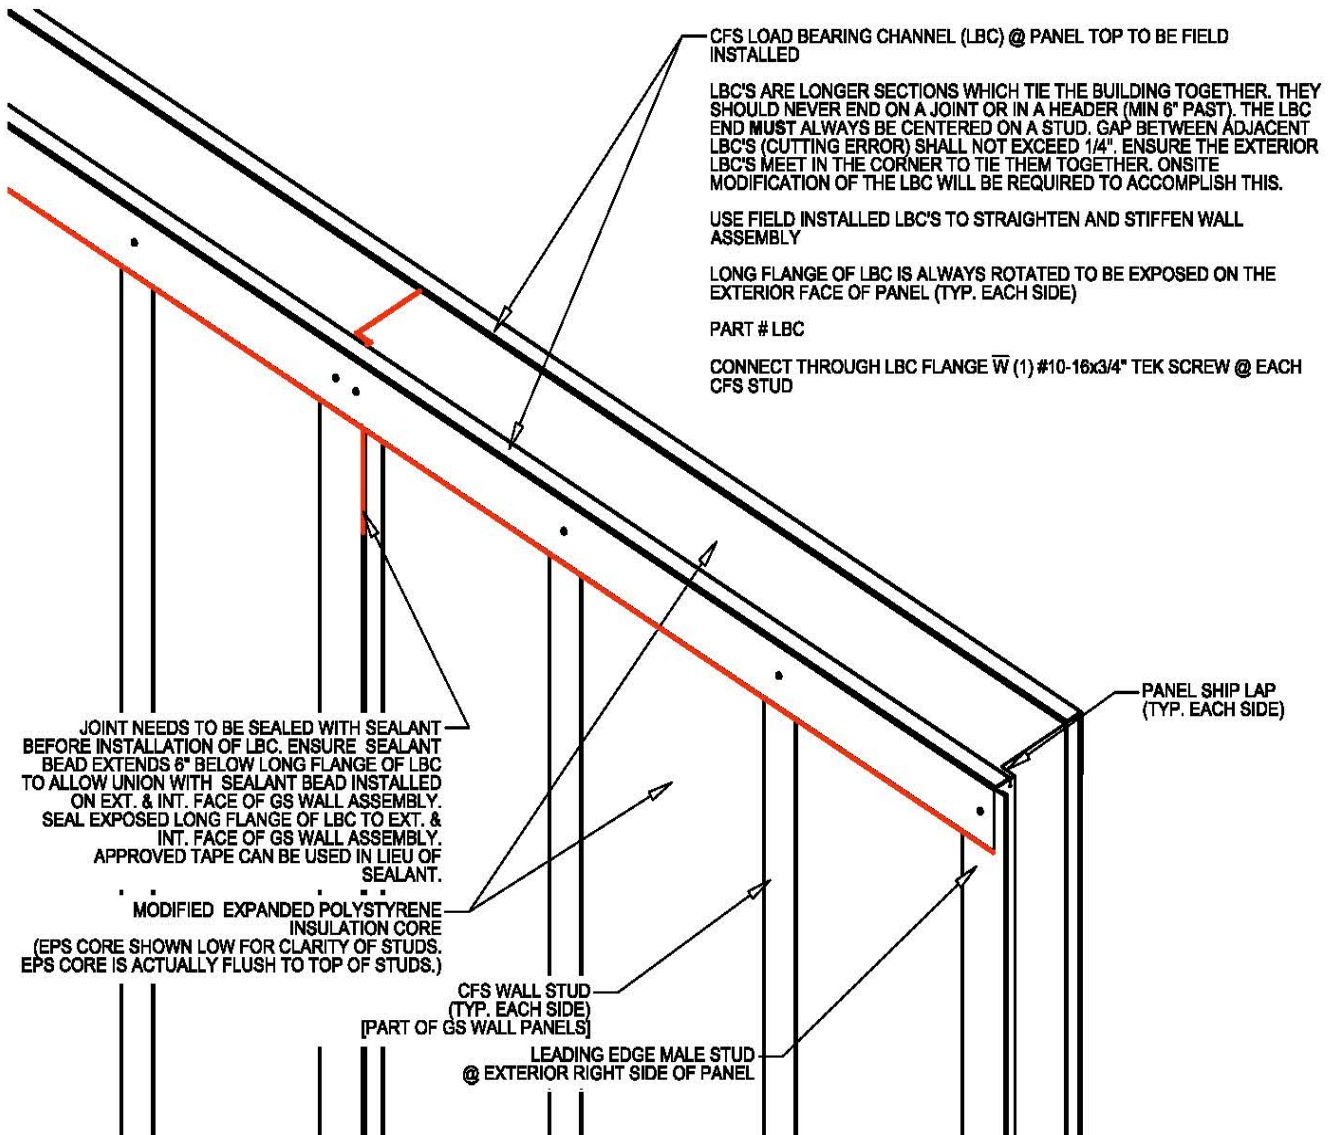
Greenstone ICE Panel Top Track (LBC) to Steel Stud Connection Details
